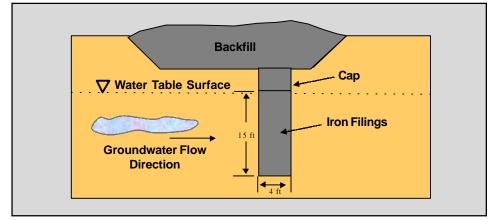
Cross section of the iron-filings treatment wall installed at Spill Site 7.
